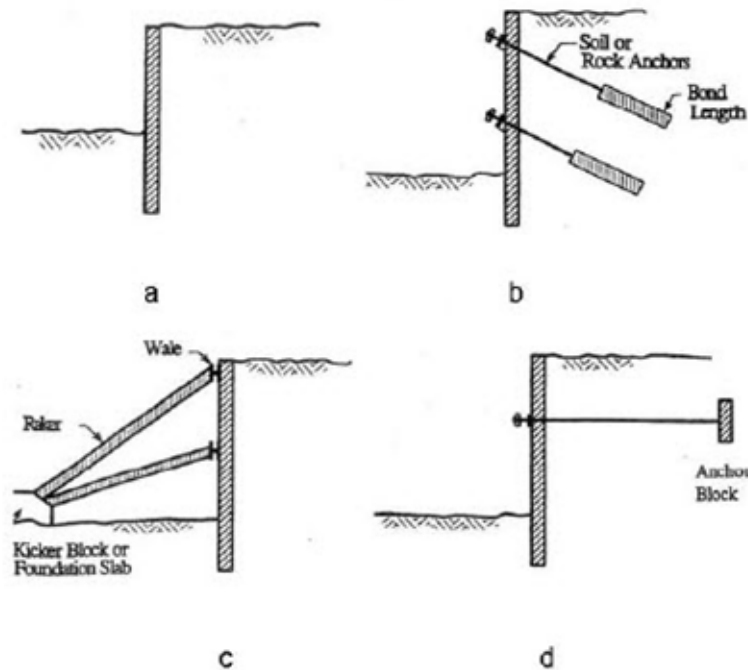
Nongravity Retaining Walls-a) Cantilever, b) Anchored, c) Braced, d) Deadman Anchored (Earth Retaining Structures, June 2008)
